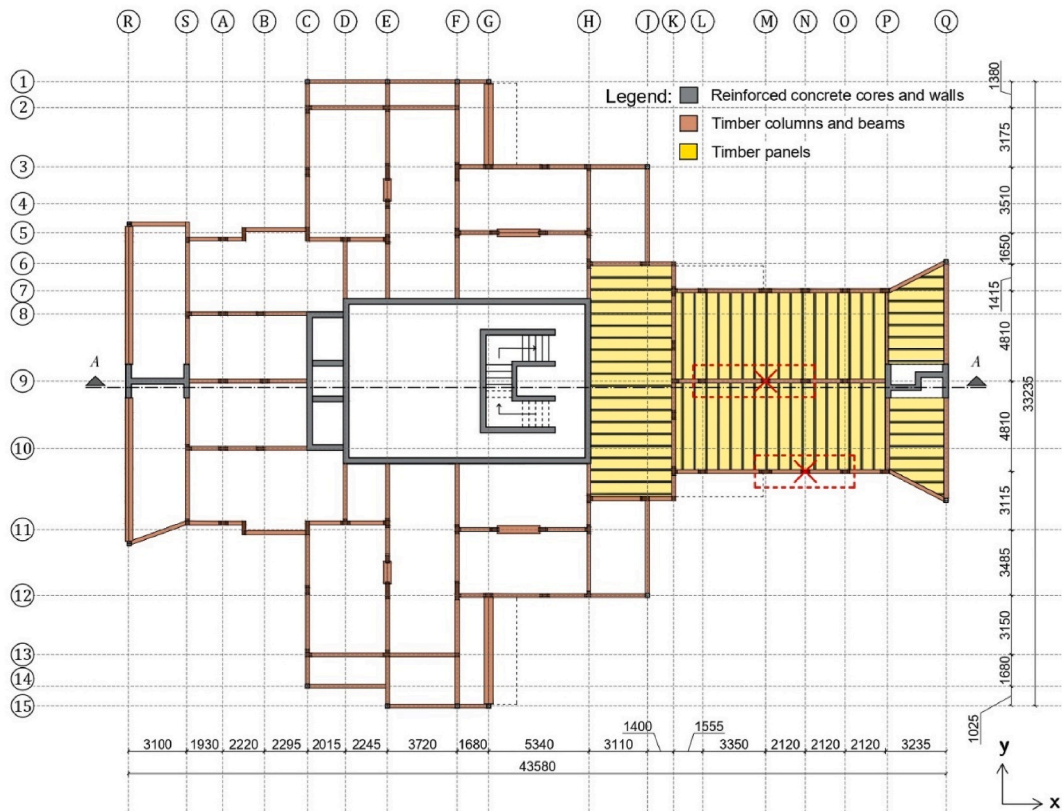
Schematic plan view of the post-and-beam timber structure (unit: mm).
